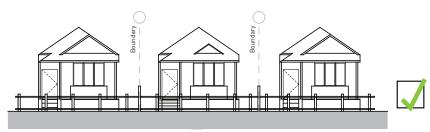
Good design: New development uses similar fencing detailing to existing.
